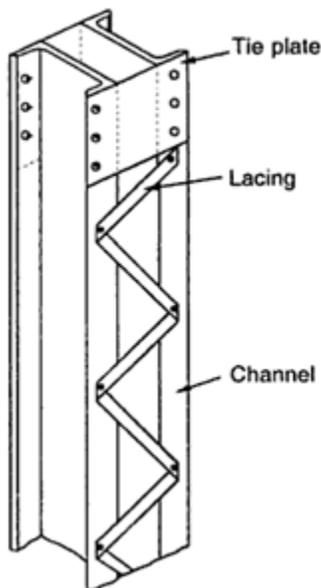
illustration of a beam or column fabricated from back-to-back channels, tie plates and single bar lacing
